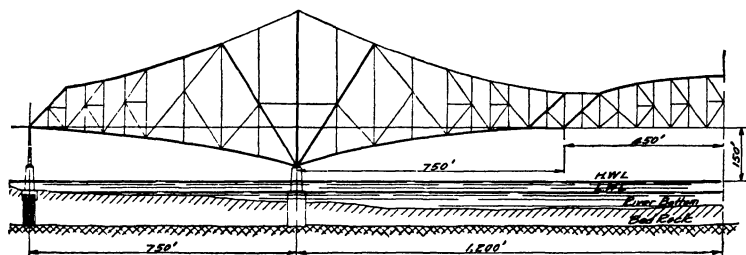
Layout for 2,400-foot Span Cantilever Railway Bridge.
